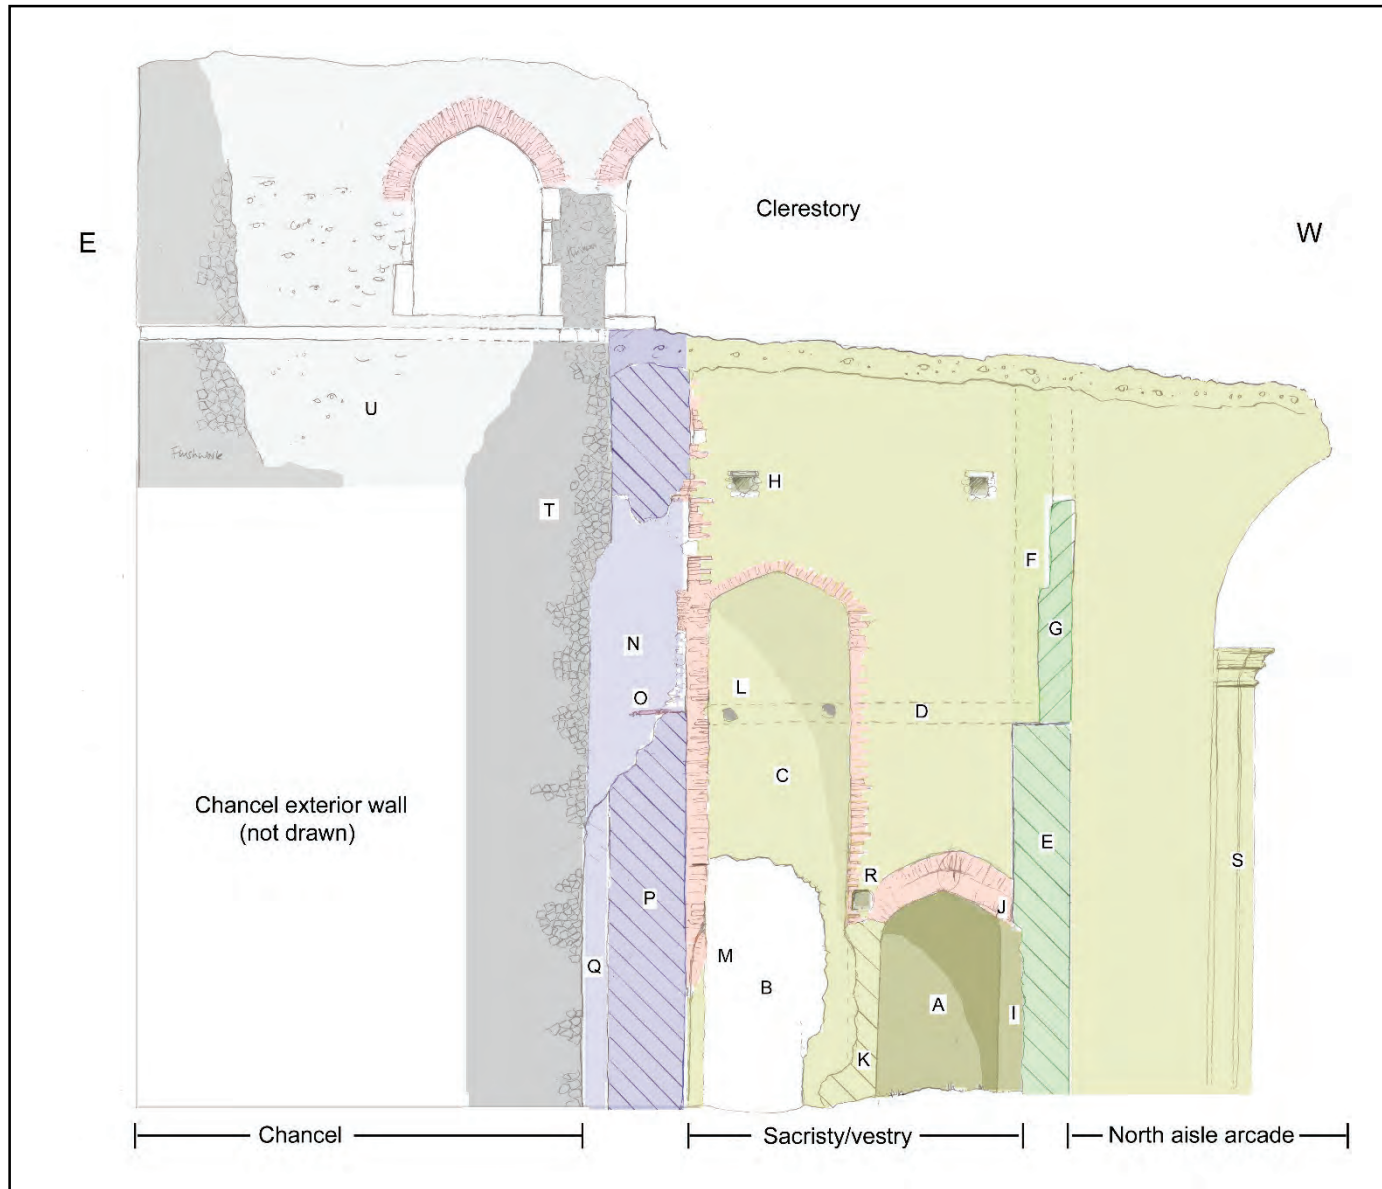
Elevation showing exterior of the north wall of the Chancel, south wall of the Sacristy and respond for the north arcade viewed from the north.
